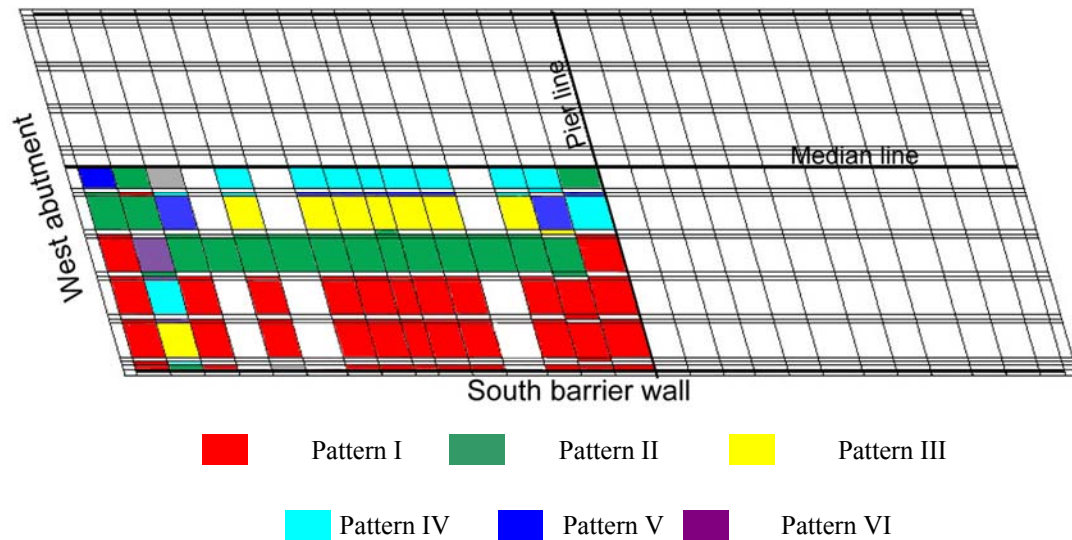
Plan view of bridge deck showing damage locations associated with different patterns for change in flexibility
